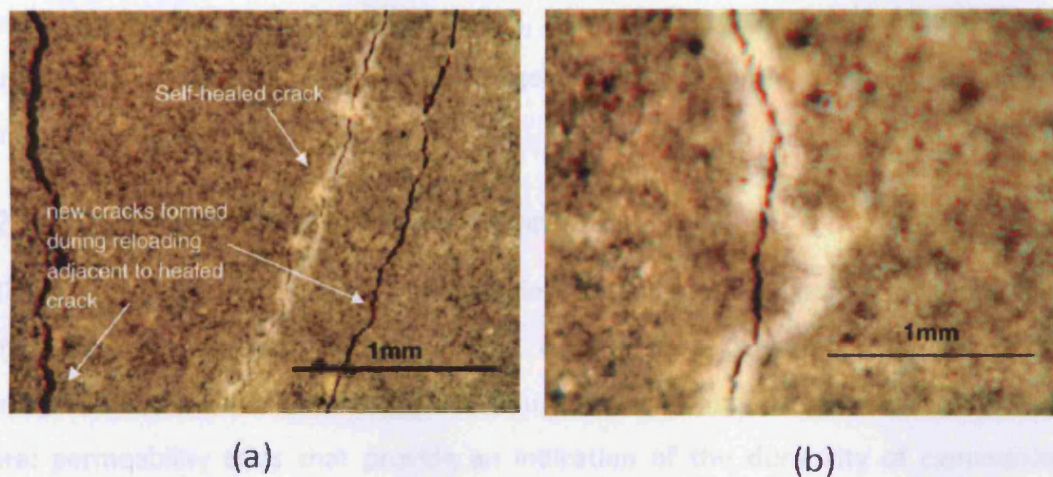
(a) Cracks in ECC material (b) New crack formed over previously healed crack (Yang et al., 2009)
